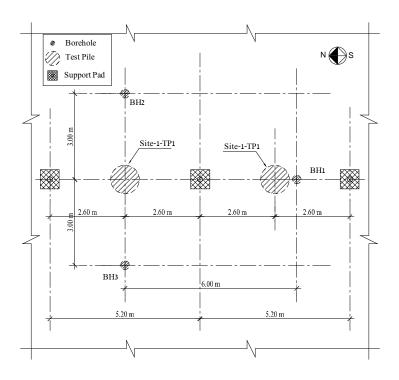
Layout of boreholes and test piles at Baridhara site (S-01)
